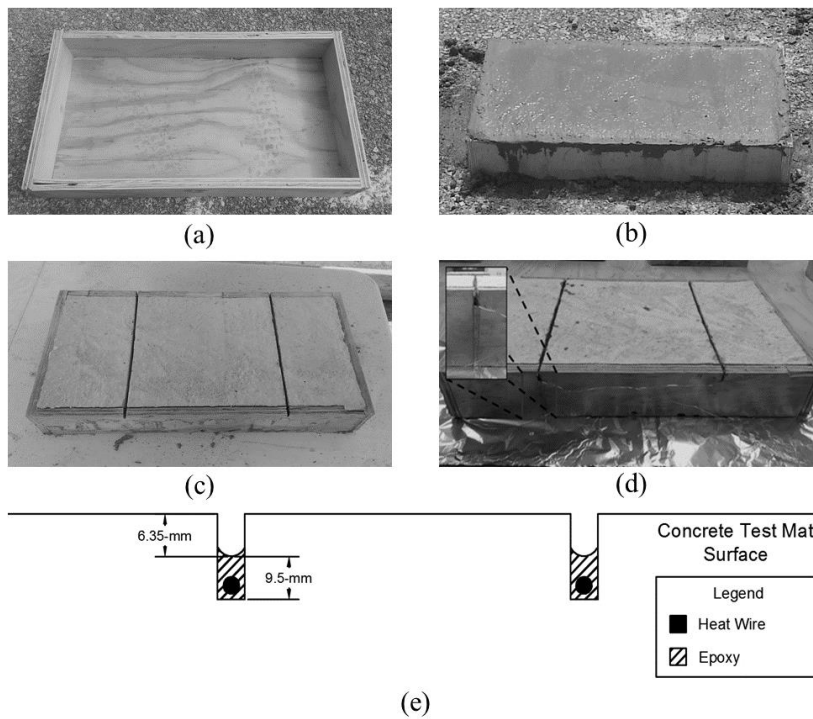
Construction of concrete test mats; (a) plywood formwork, (b) casting test mat, (c) grooves cut in test mat surface, (d) placement of heat wire and epoxy, (e) diagram of surface embedded heat wire.
